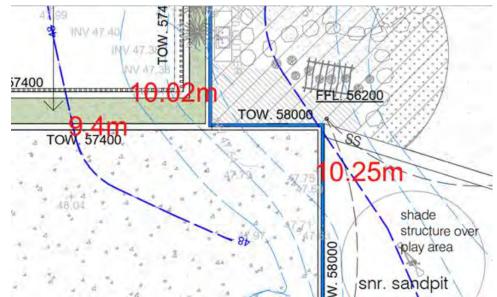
Location of the contravention of the building height standard and the maximum building heights shown in red. Source: Floor Plan Level 2, TesserArch dated 23 January 2023.
